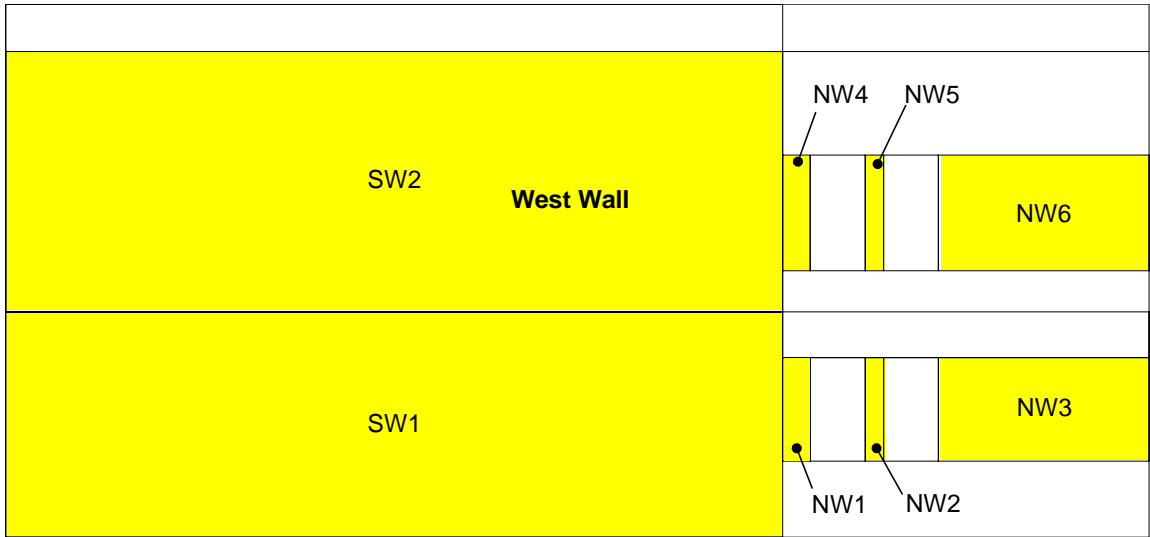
Piers of west wall using the pier-type collapse mechanism.
